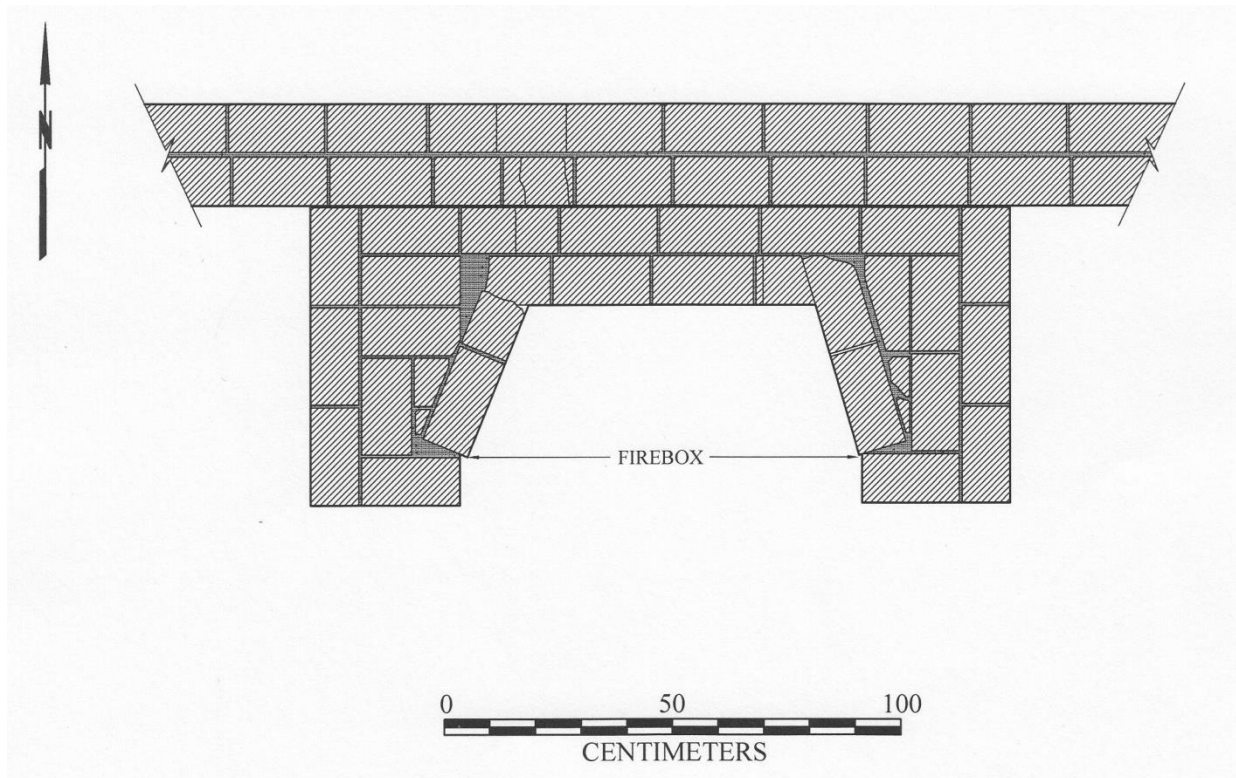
Plan view of north end wall of House C, illustrating the foundation of a fireplace. Opposite this fireplace, located on the south wall of the house, was the foundation for a chimney stack meant for venting a stove (Feature 3).
